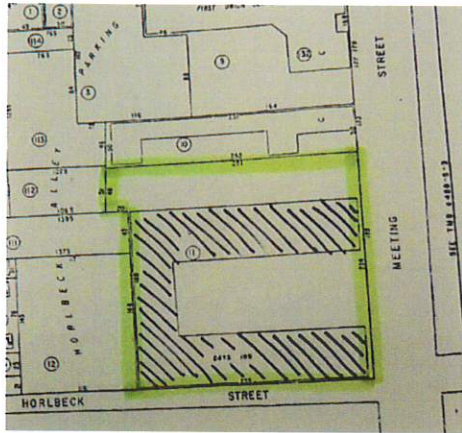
Site plan of 155 Meeting Street after demolition of former structures 1967
